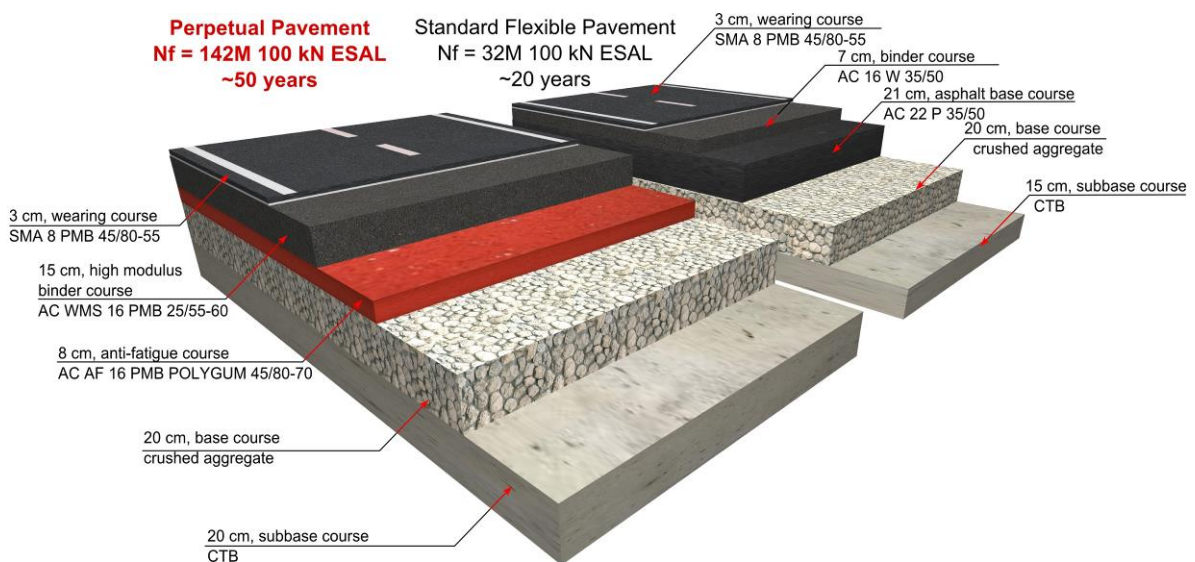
Cross section of perpetual asphalt pavement for S8 expressway in comparison with traditional standard asphalt pavement
